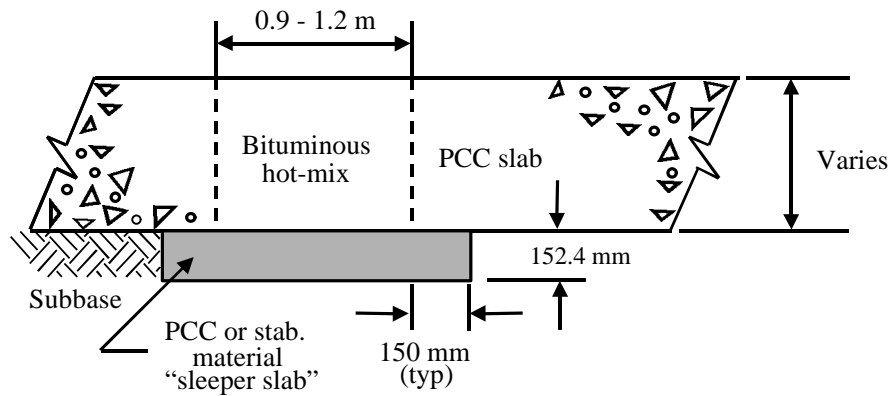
Cross-section of wide pressure relief joint.⁽²⁾
